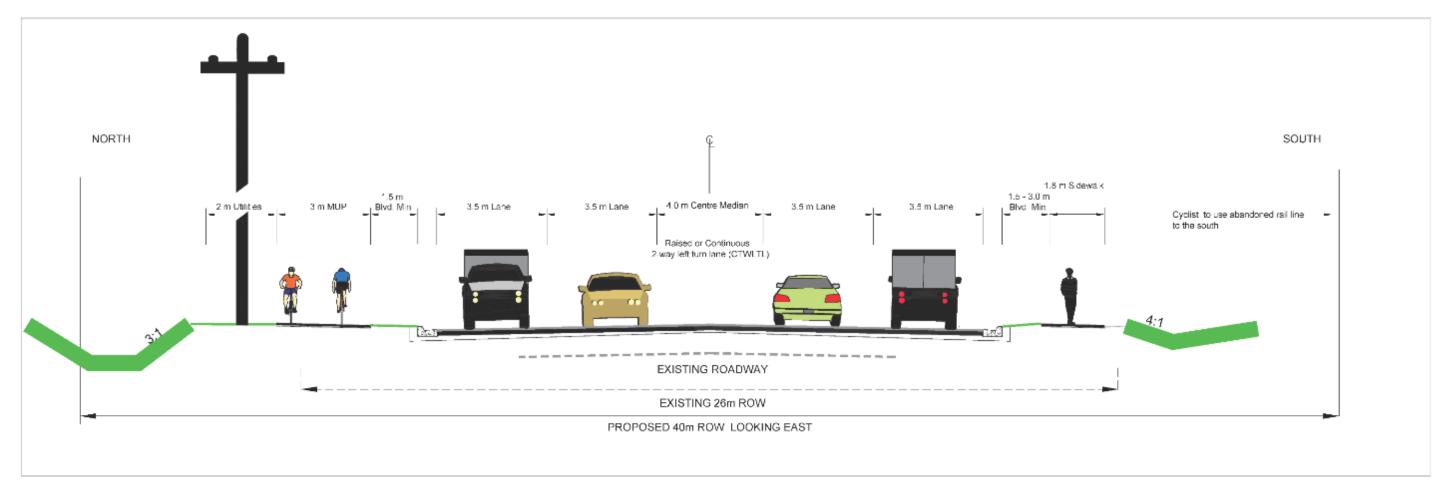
Section 1 and 2 (Highway 401 to Concession Road 9) Recommended Cross Section
